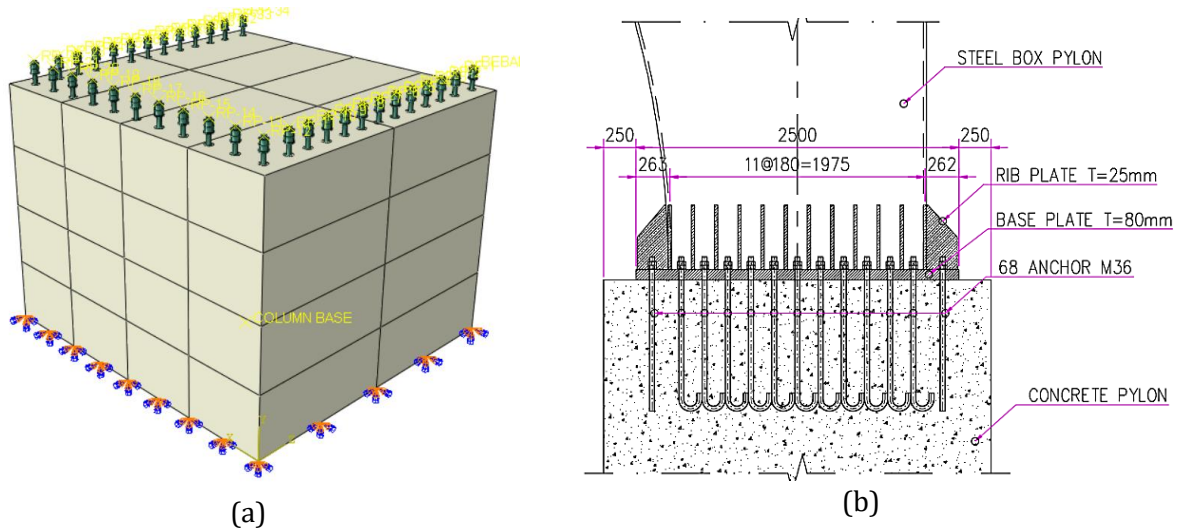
Geometric details and boundary conditions of the anchor connection model: (a) Isometric; (b) Longitudinal section
